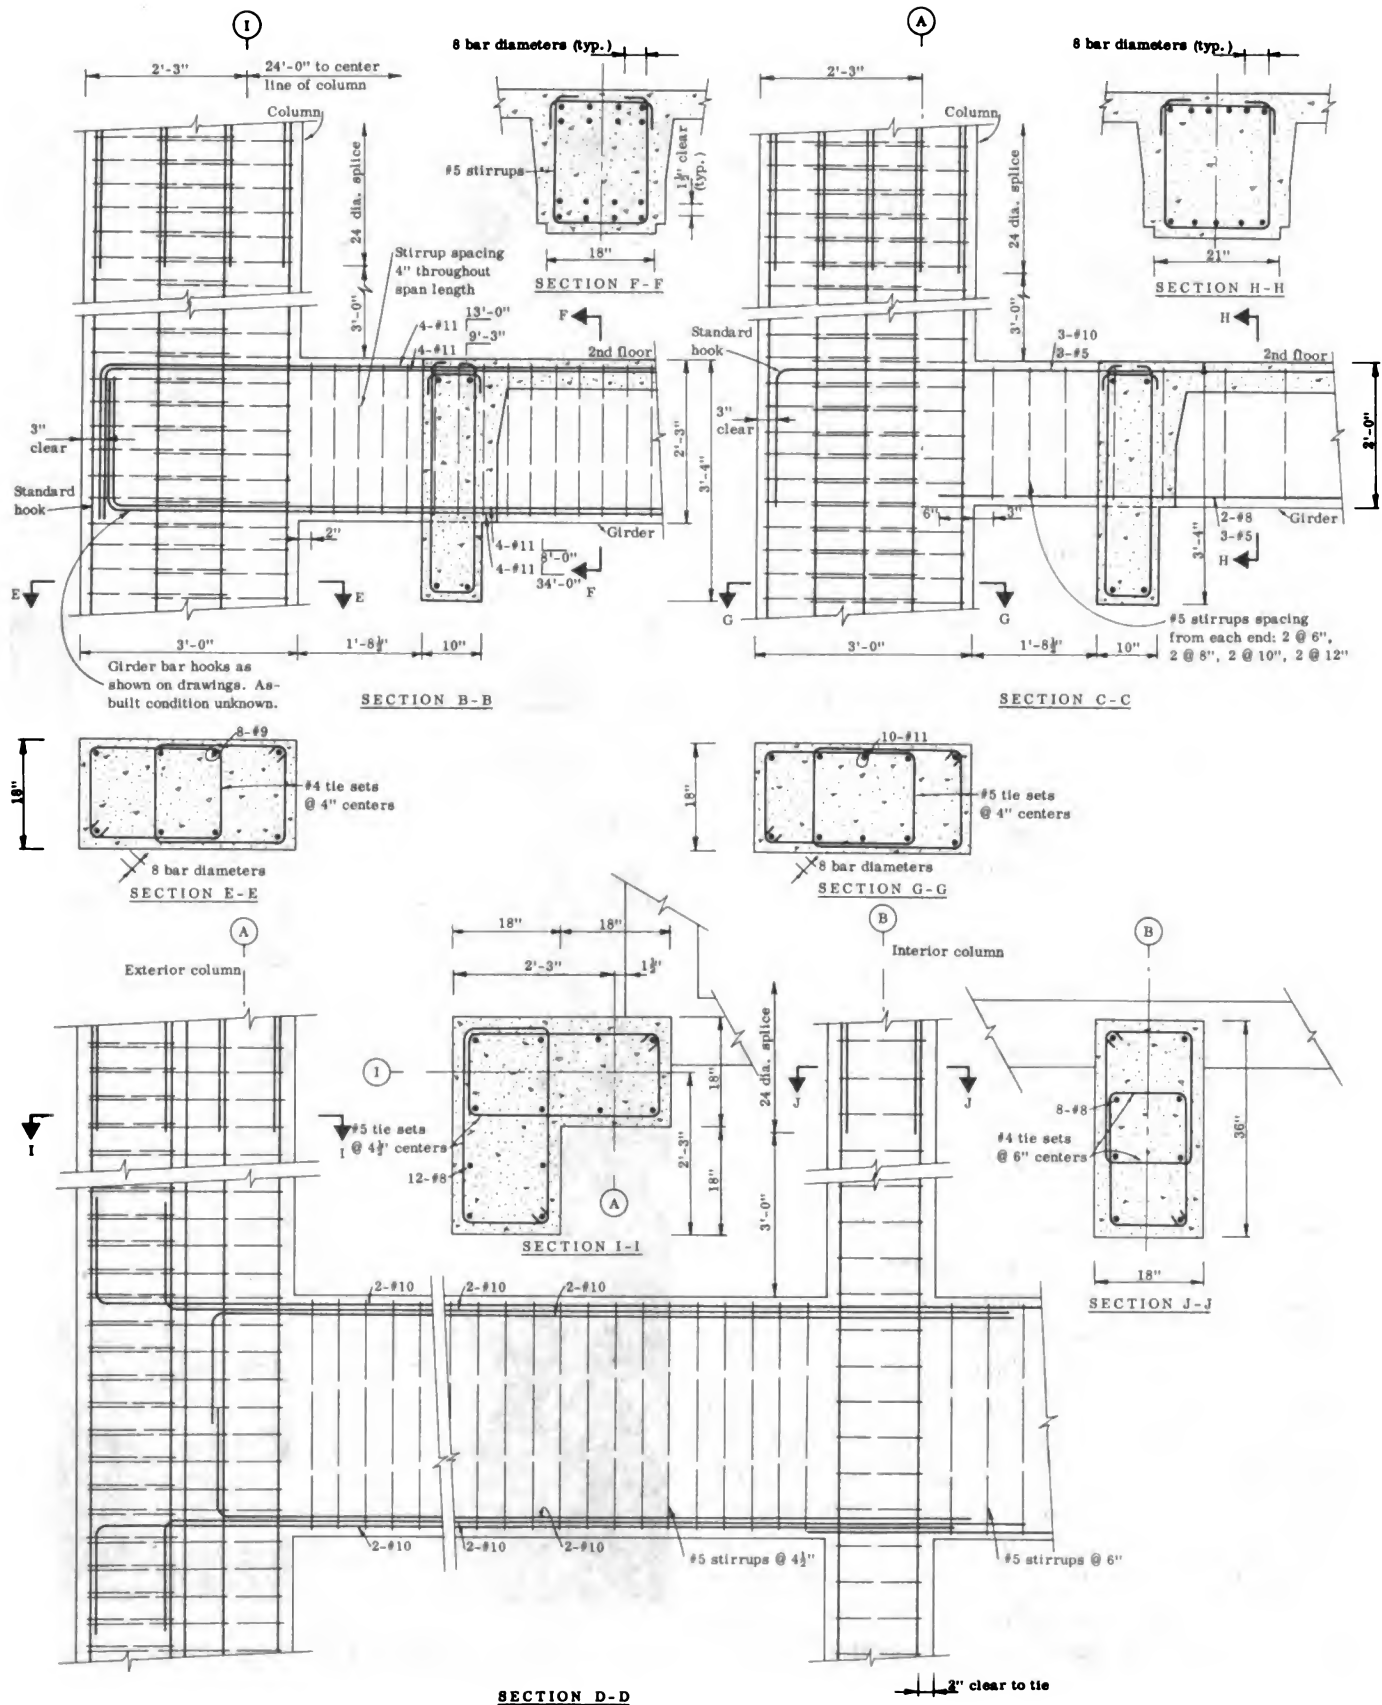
Bank of California. Typical details of reinforcement at column-girder joints.
